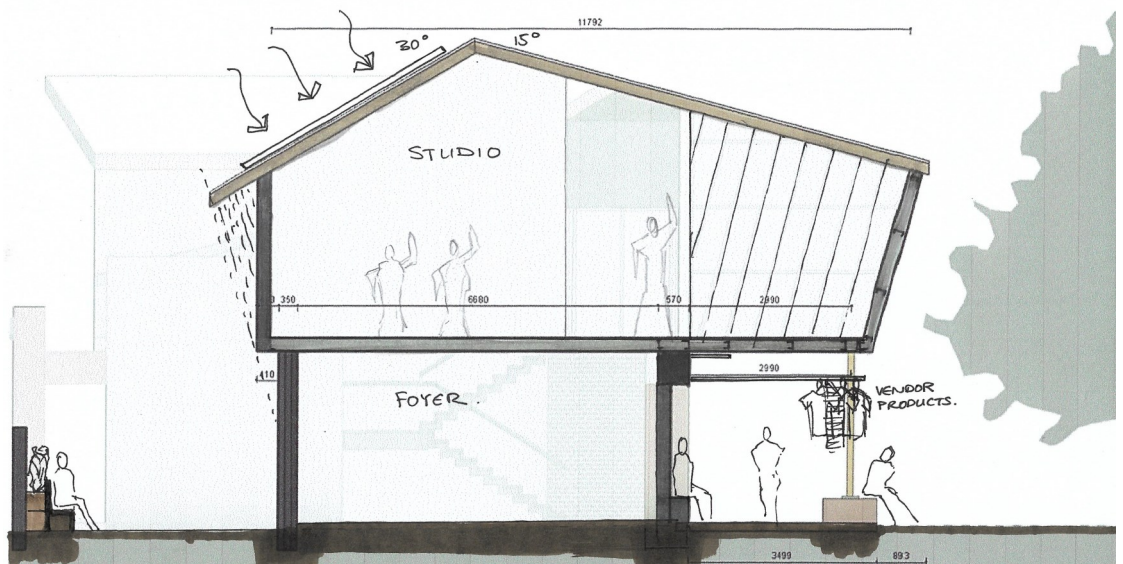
Section Development of Cultural Practices Building (Author 2020)
